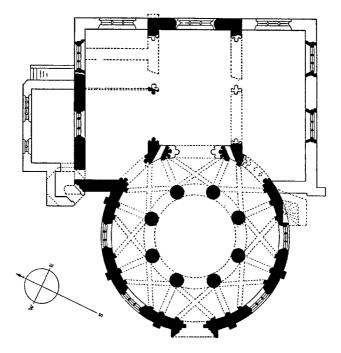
Plan, Holy Sepulchre, Cambridge. The structures to the east of the rotunda are later
